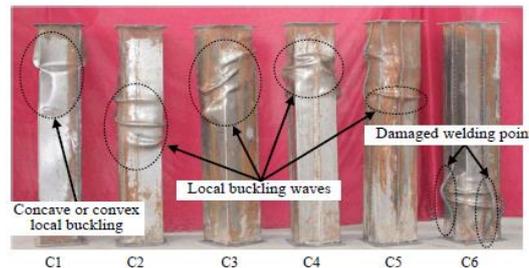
Failure Mod for column specimen research Yang and Xu [4].
